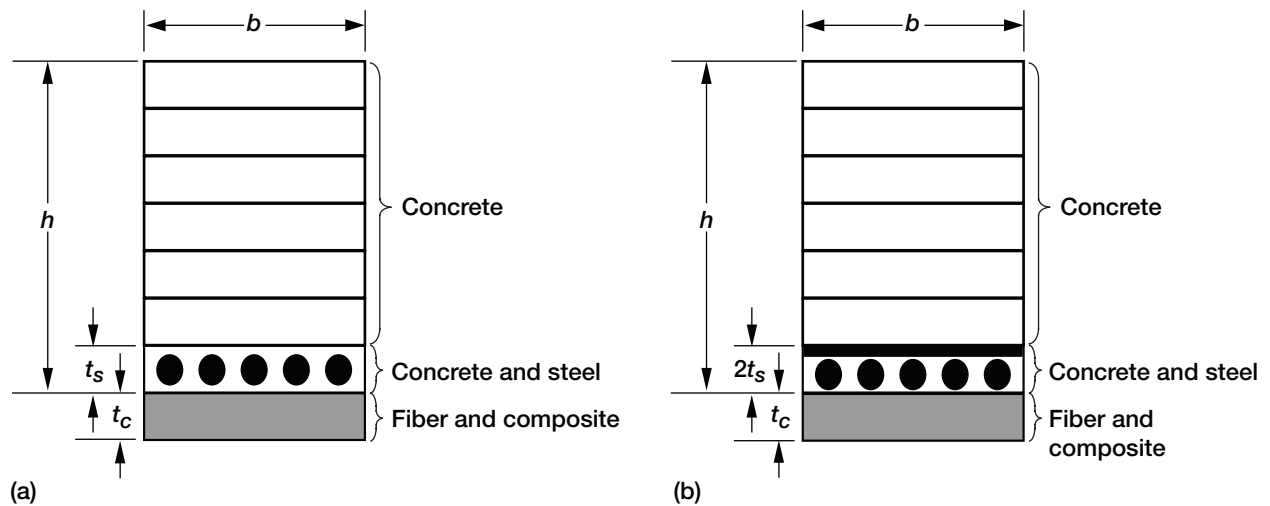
Cross section of two reinforced concrete structural members. (a) One-way-reinforced section.
